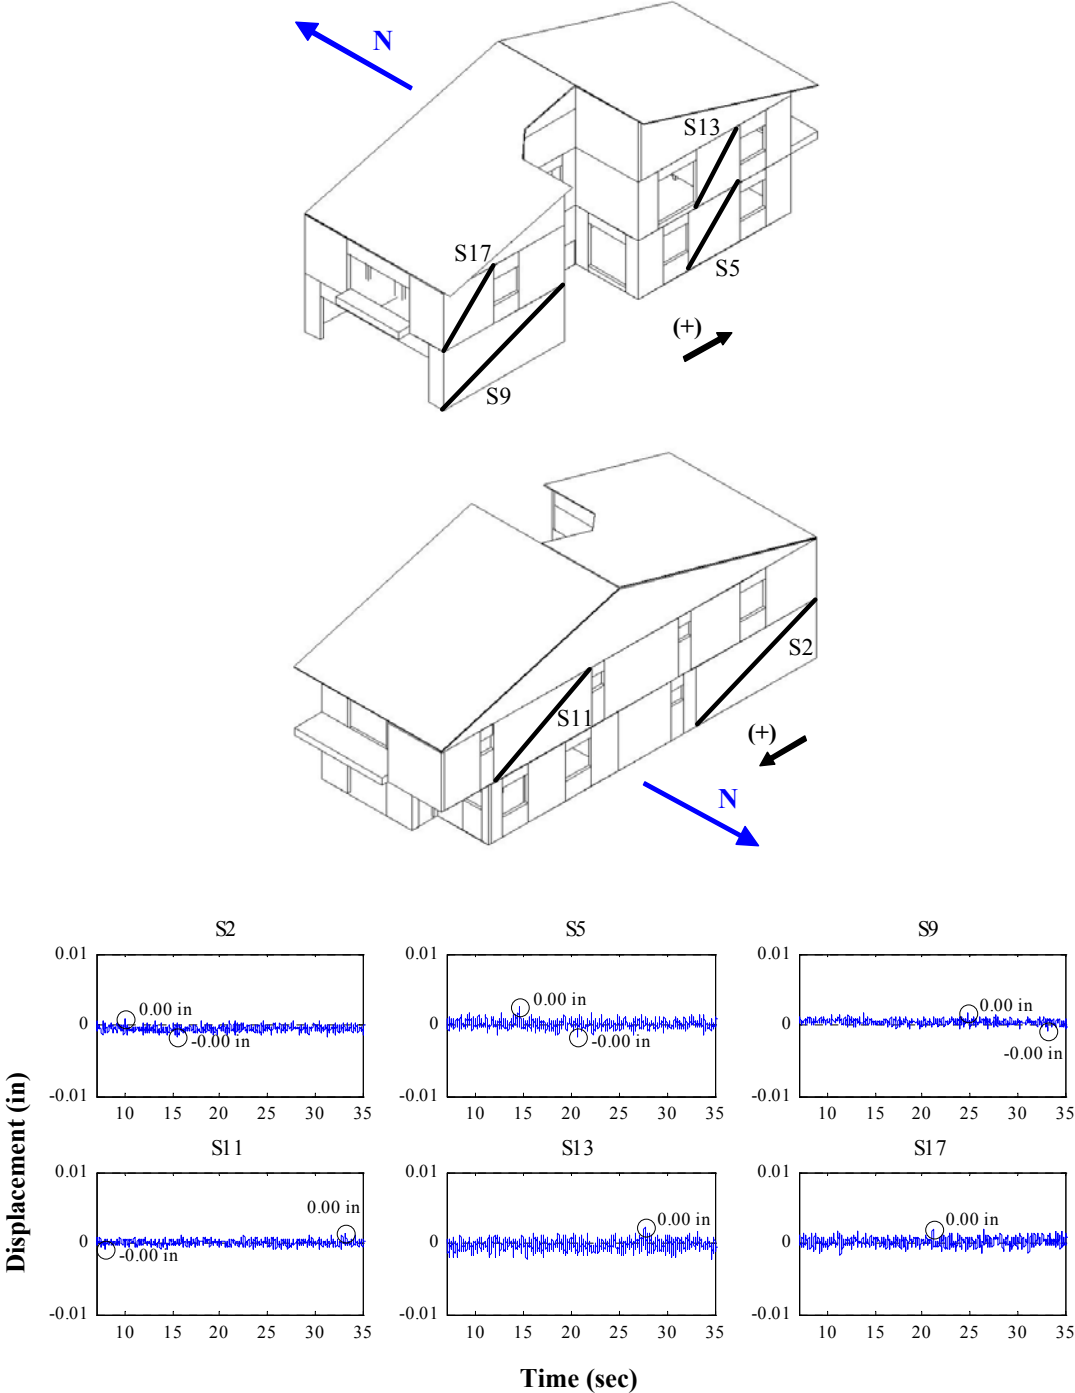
Wall deformations of east-west external walls for Test NWP1S01
